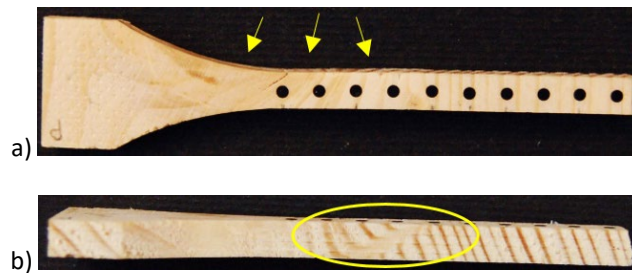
Part of the specimen TT-120-05-REB5 after failure. a) Top view, b) Side view.
